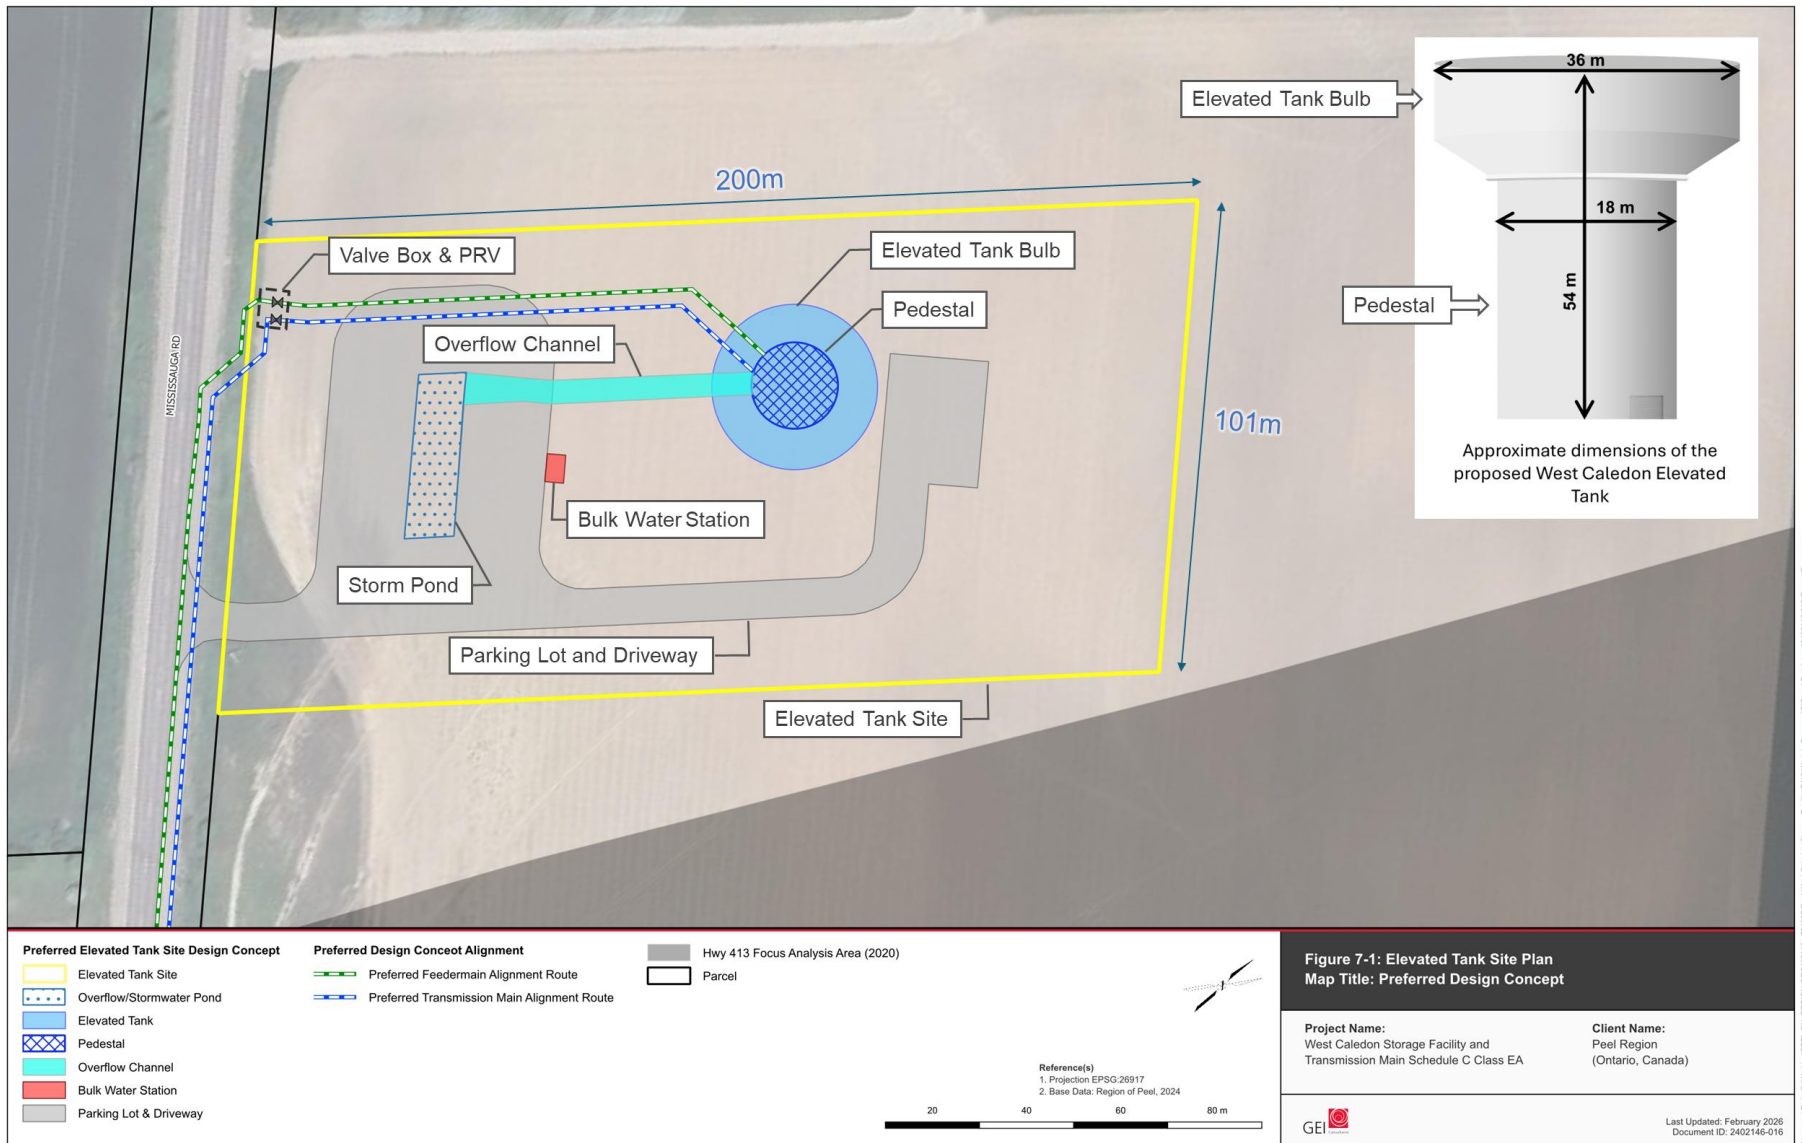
Elevated Tank Site Plan Preferred Design Concept
